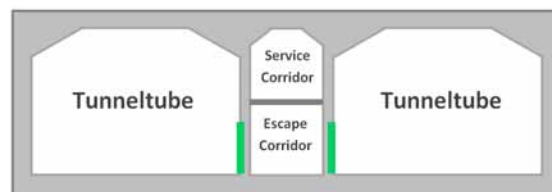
Schematic presentation of cross section of a common Dutch road tunnel
